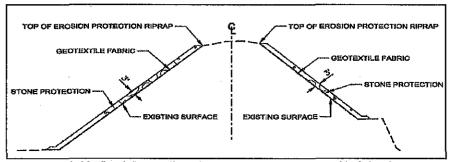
Bank Protection along Sacramento Bypass Training Levee.
